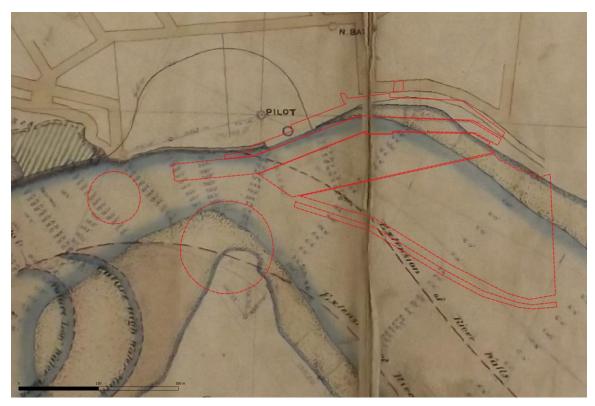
Detail of Feb 1885 plan of Wanganui Harbour
